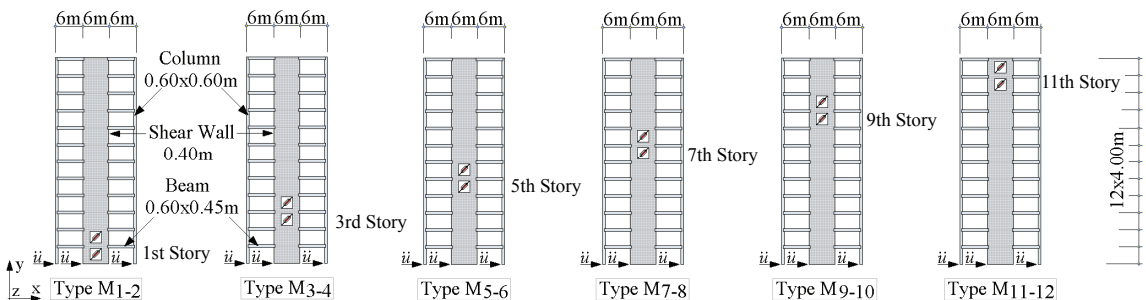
Placement of dampers within 12-story frame-shear wall structures.
